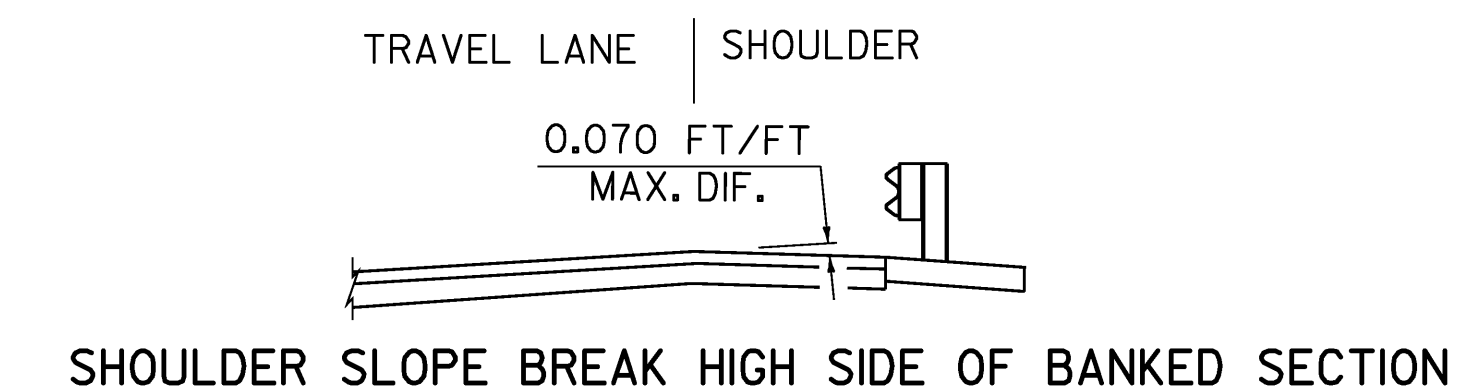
GUARD RAIL ON HIGH SIDE OF BANKED SECTION
